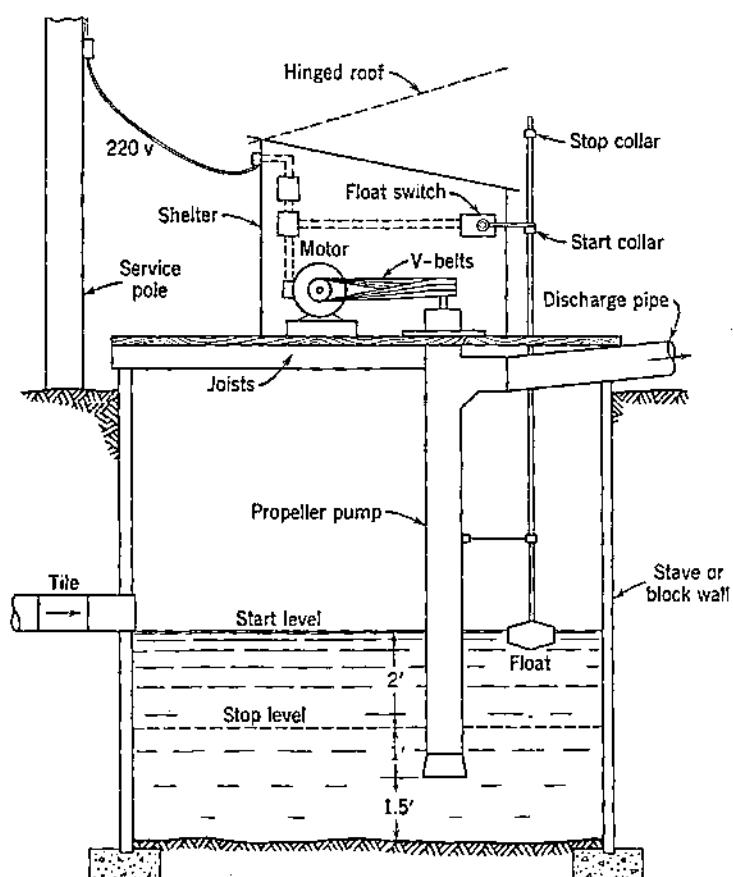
Typical small drainage pumping plant. (Redrawn from Larson.⁶)
